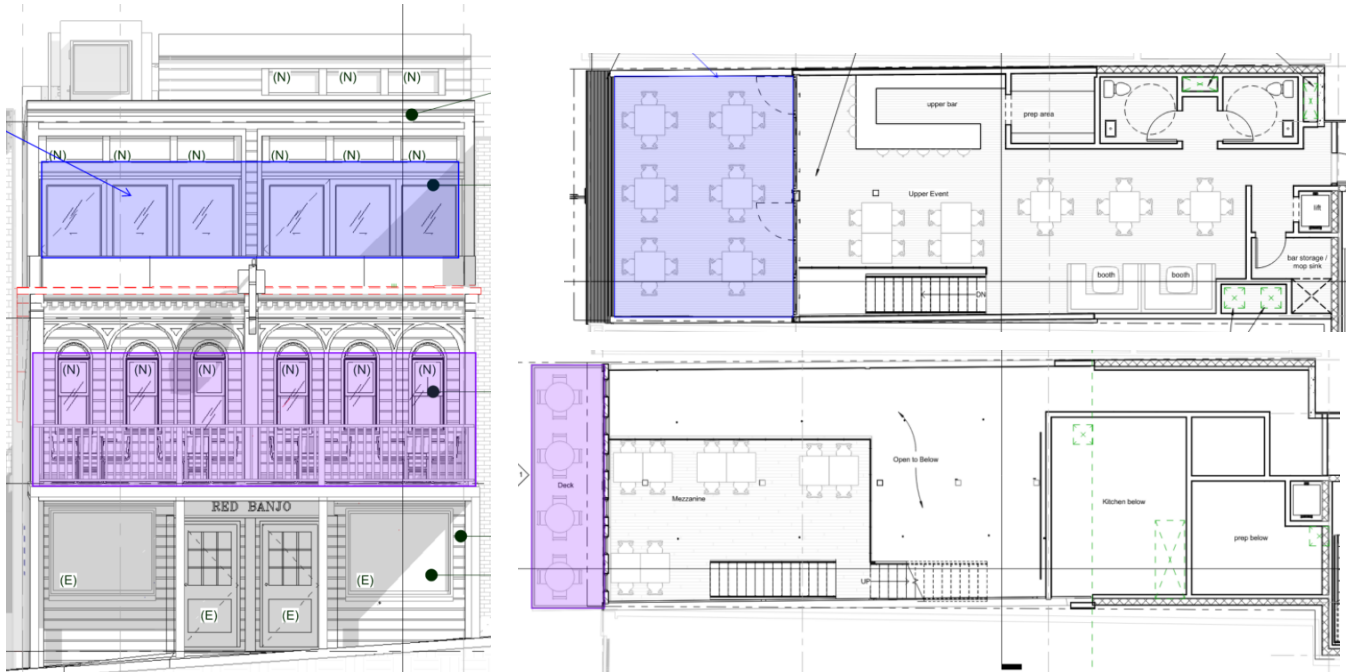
322 Main Street Outdoor Dining proposal; rooftop deck dining highlighted in blue and porch dining highlighted in purple by staff.
